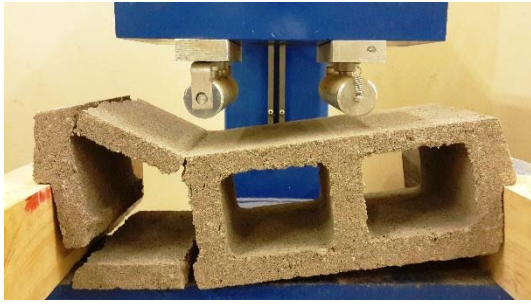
Triple-core type concrete masonry rebated filler block (medium)
